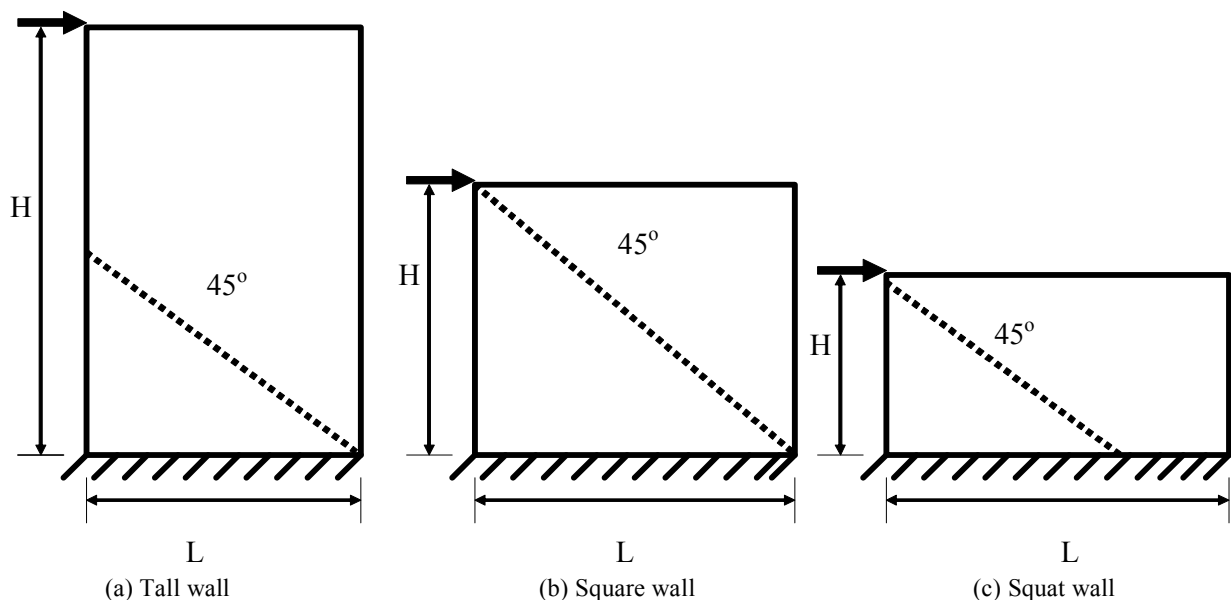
Orientation of diagonal cracks in masonry shear walls (Shing et al. (1990a))
